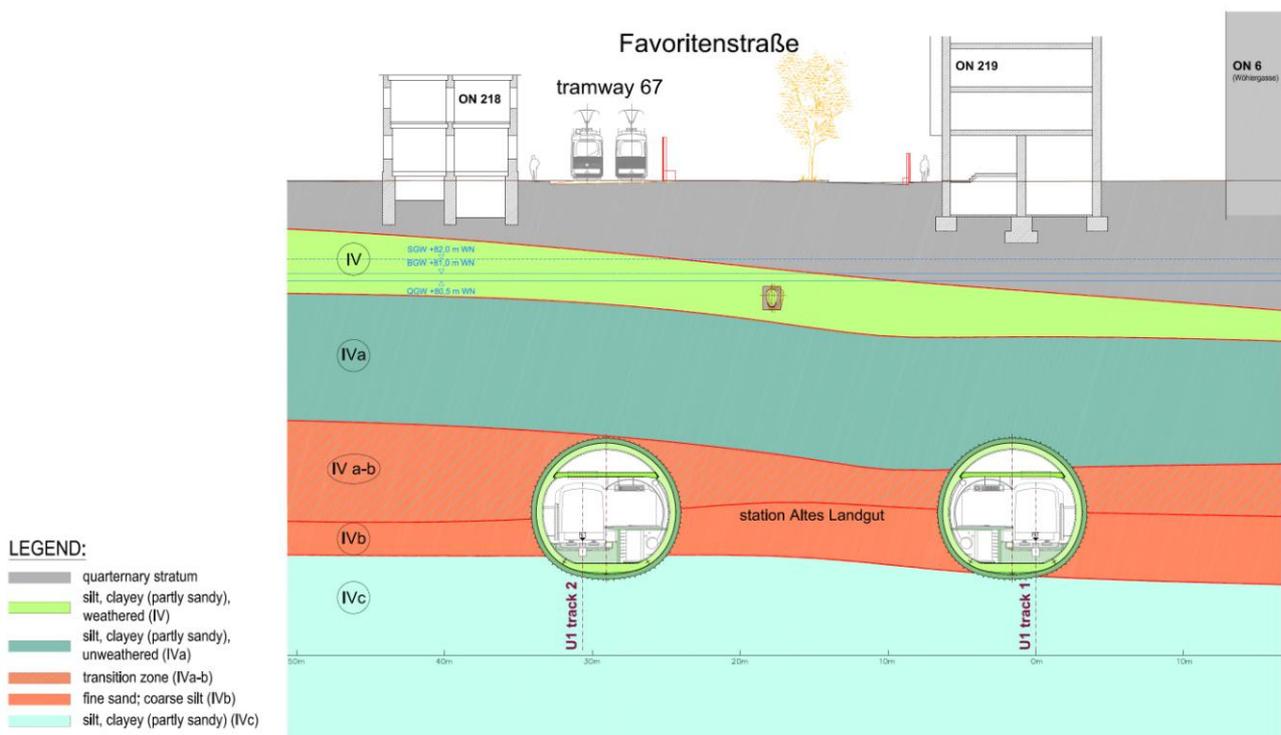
Cross-section, platform tunnel (Ref. [2])
